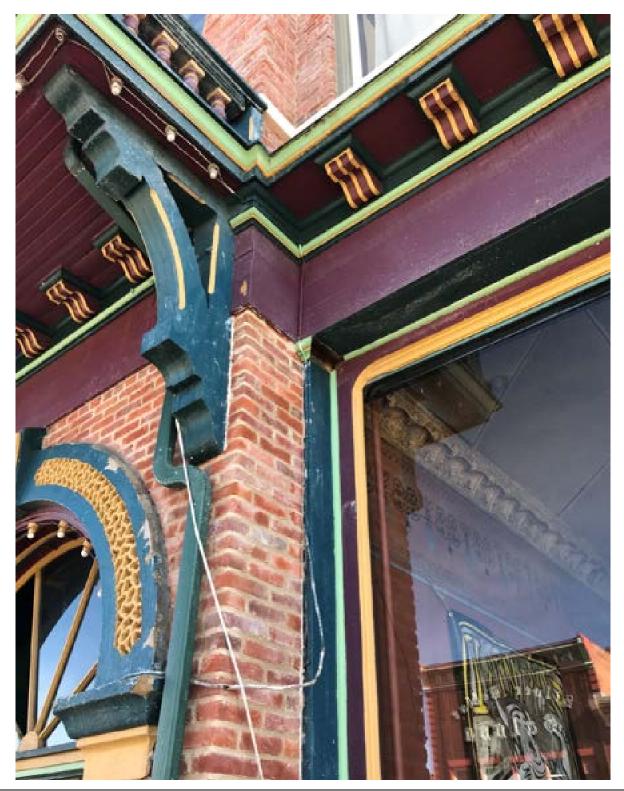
South side of Central Main Entry. Wiring serving the decorative lighting at the fanlight window is loose, susceptible to damage, and posing a safety hazard. The wiring will be replaced with concealed wiring, where possible. The downspout and supporting wood blocking will be removed following the rehabilitation of the balcony where a scupper for drainage is planned. A masonry allowance is provided with this project for repairing damaged brick behind the blocking. The brackets supporting the decorative cornice and the underside of the balcony can be seen in this view.
